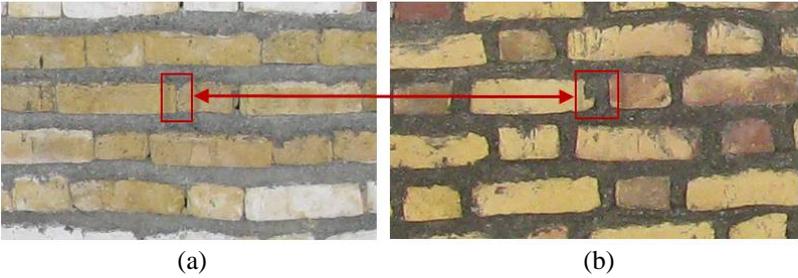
Construction detail of head joints (a) Unfilled head joint (b) Filled head joint
